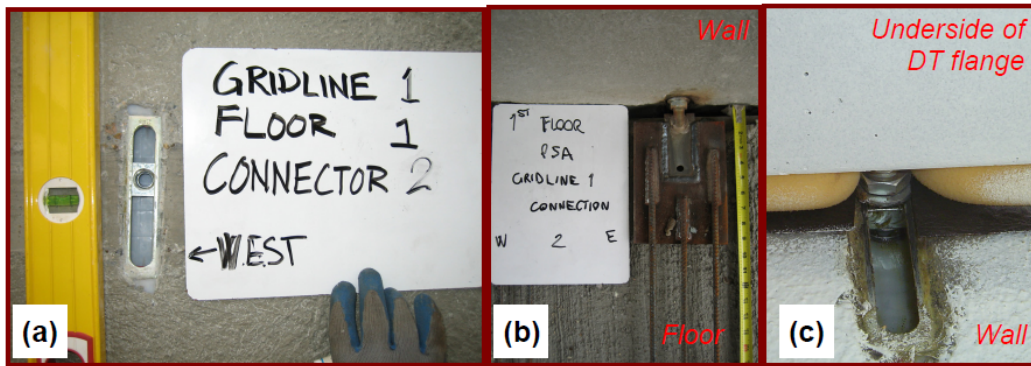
Shake table test setup – wall-to-floor connection (after Schoettler 2010): (a) vertical slot in wall, (b) insert tab welded to floor embed plate, and (c) underside view of slotted connection.
